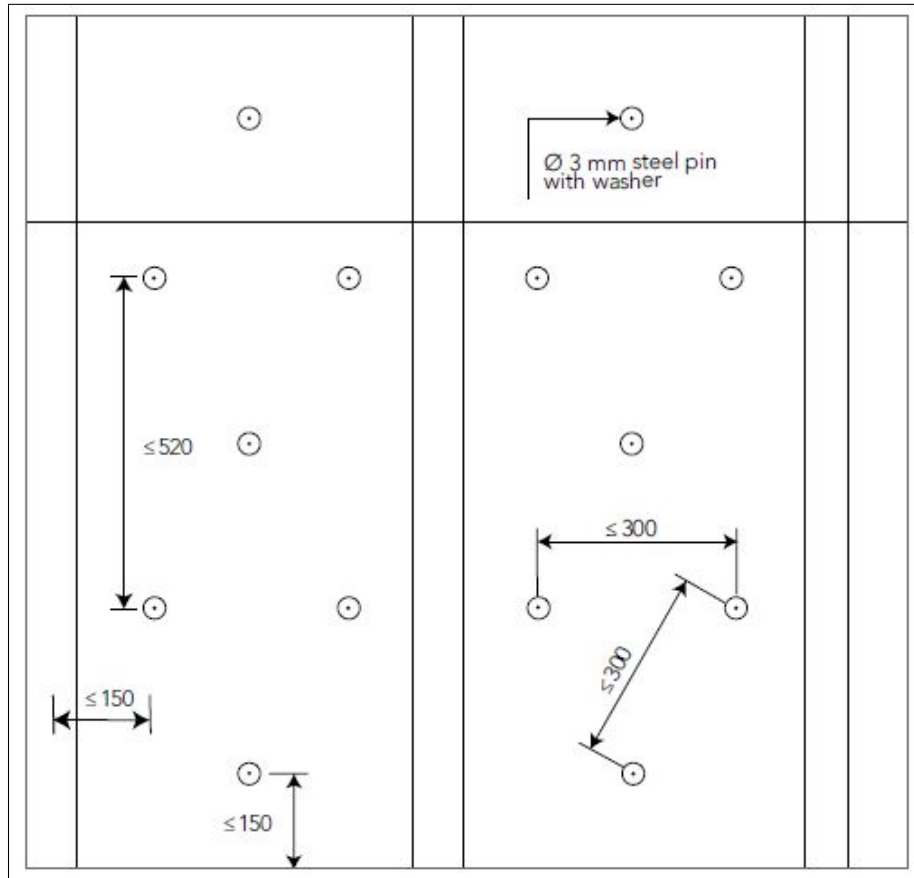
Rockwool A-15 diagram showing standard location for the mounting pins [16]
